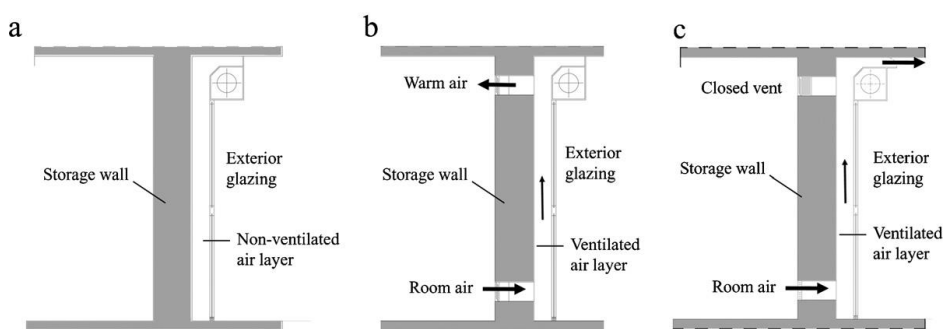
Operating schemes: non-ventilated solar wall (a); Trombe wall in winter mode with air thermo-circulation (b); Trombe wall in summer mode with cross ventilation(c) (Stazi, Mastrucci & Perna, 2012)
